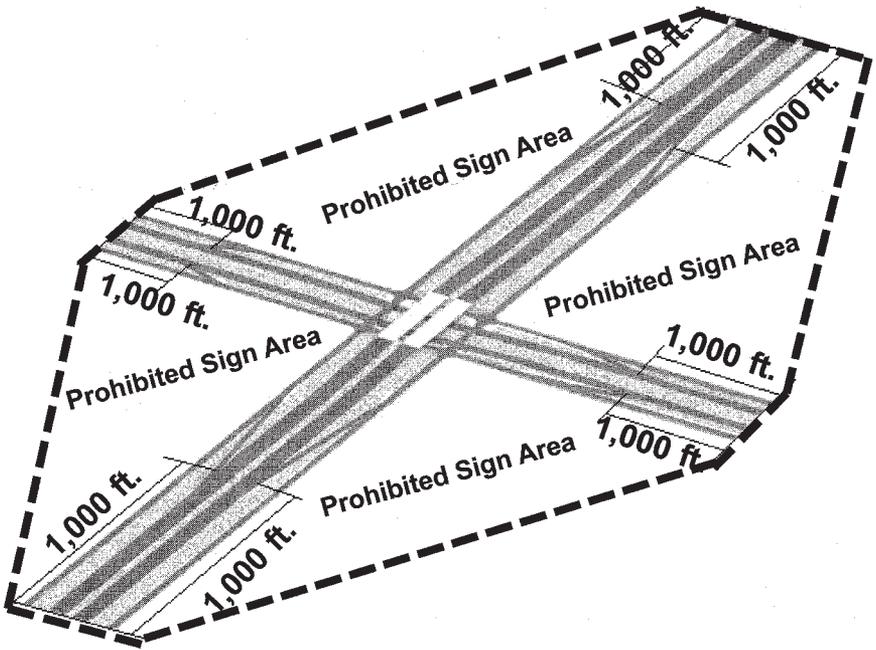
Typical Interchanges Showing Ramps and Connecting Roadways
